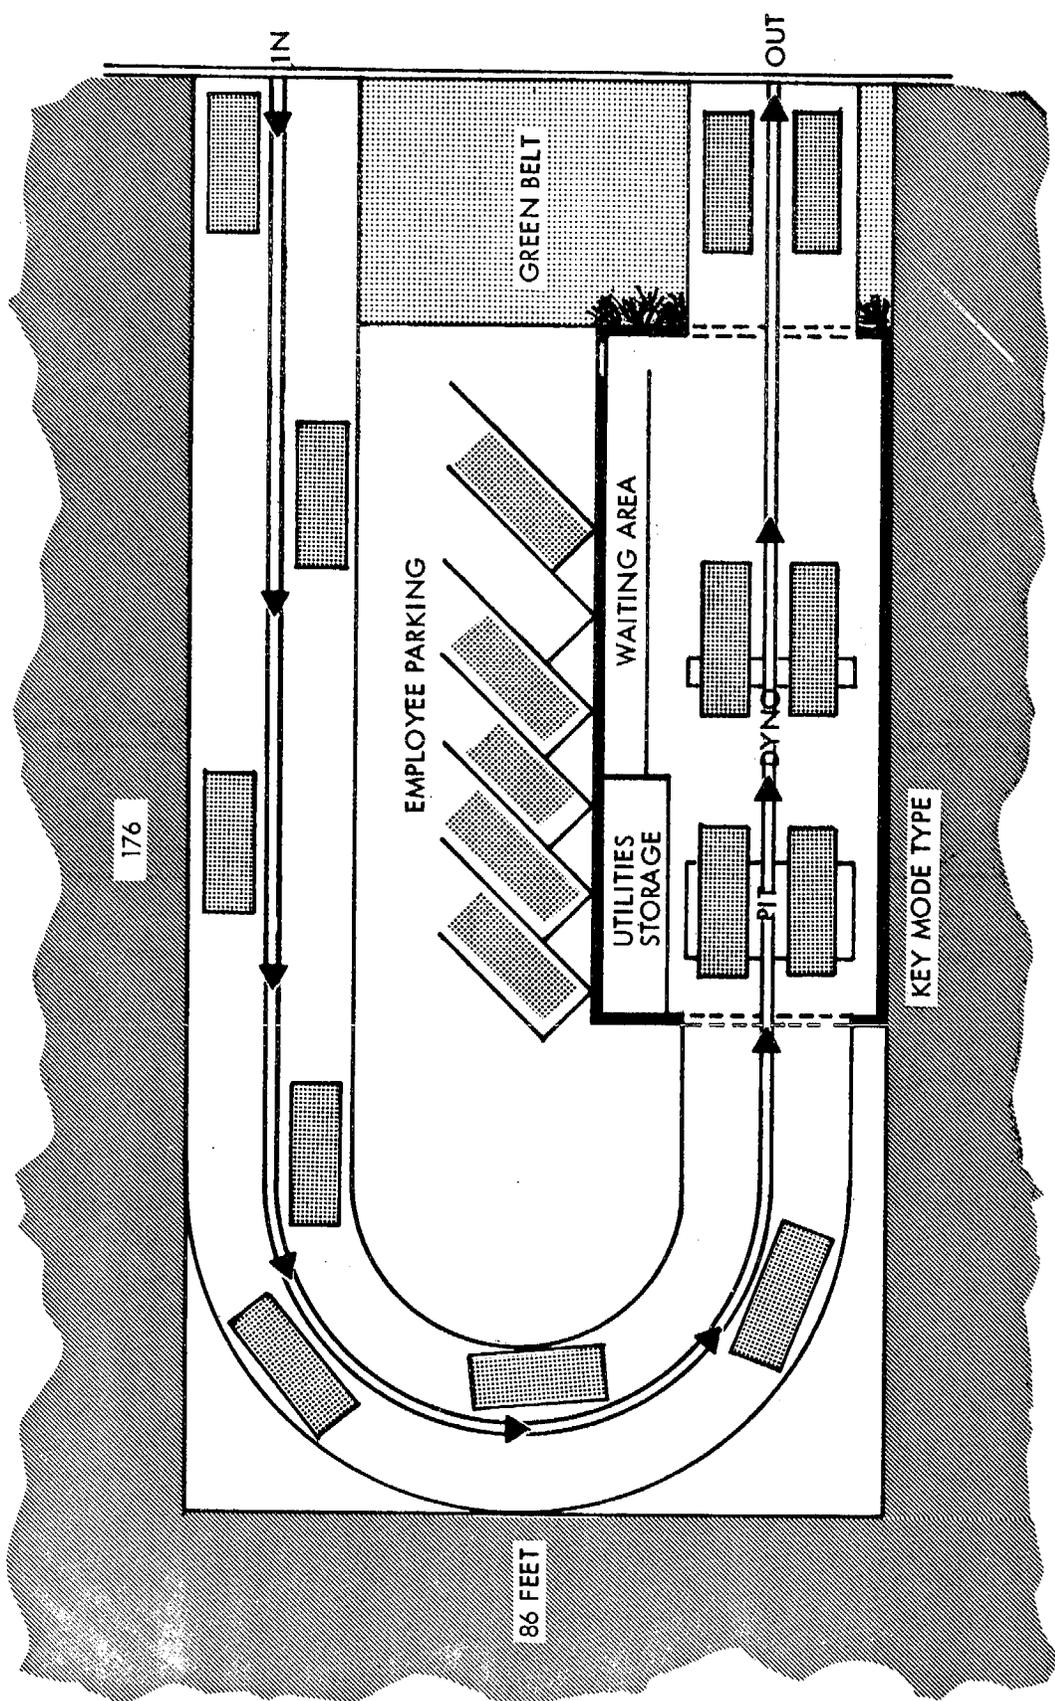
TWO-LANE STATION FLOOR PLANS (Sheet 2 of 3)
